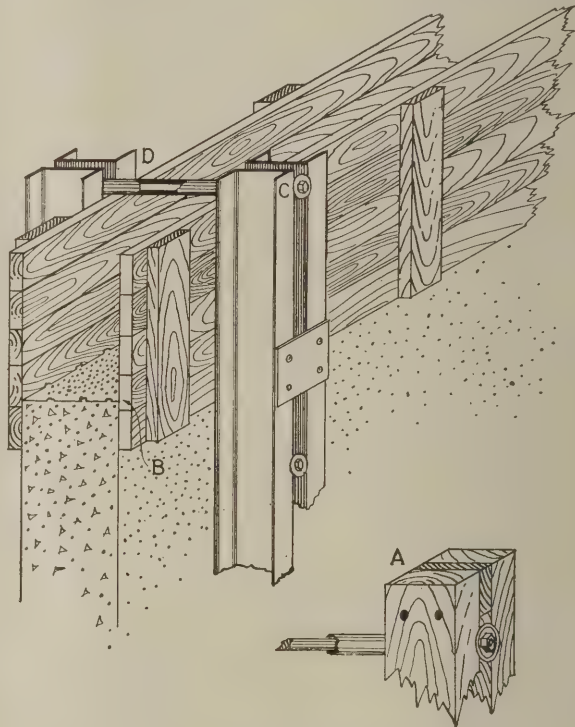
Showing How Walls of Large Buildings Are Constructed.
